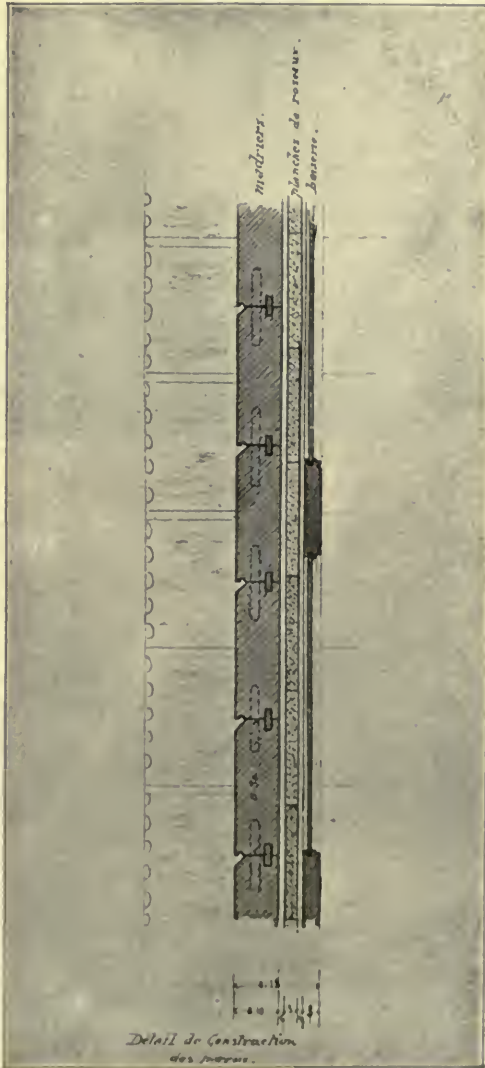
SECTION OF WALL OF A MODERN CHALET.
